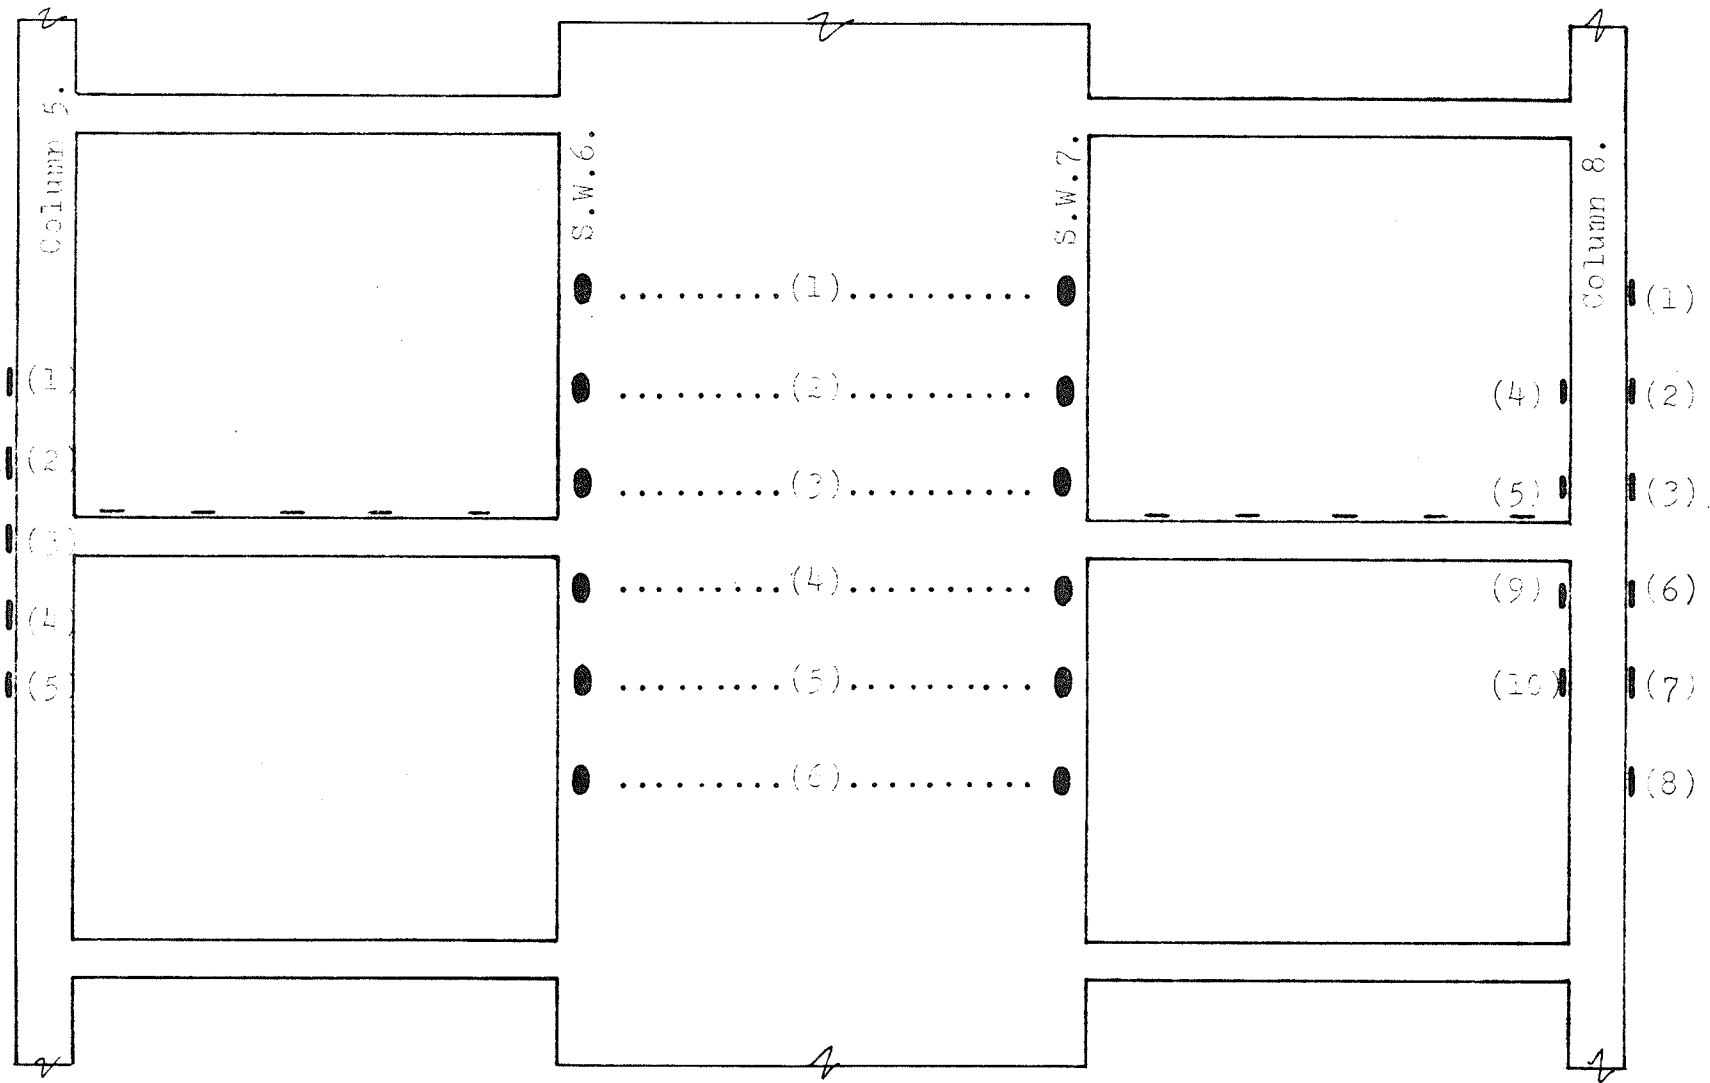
LOCATION OF ELECTRICAL STRAIN GAGES ON SHEAR WALL AND COLUMNS
